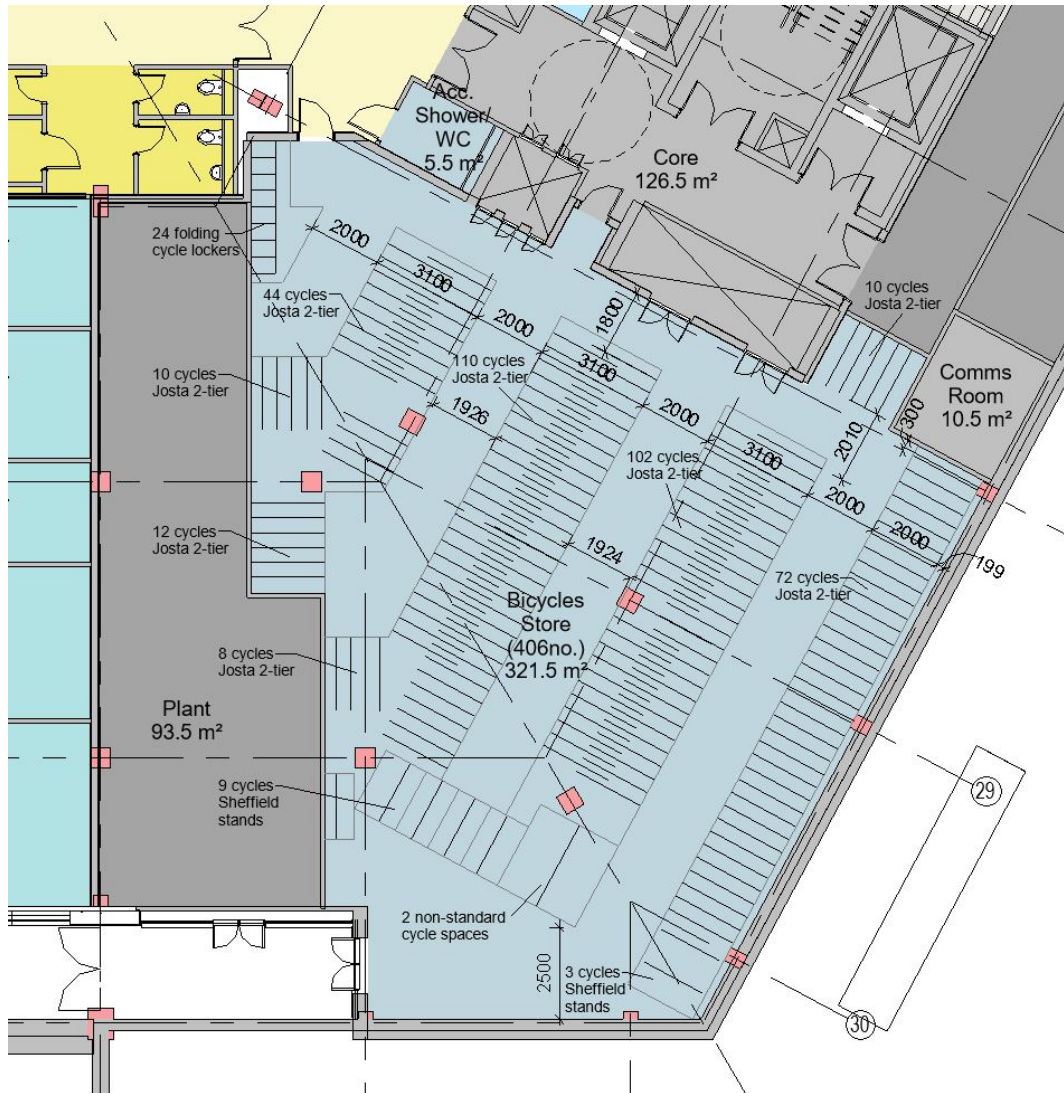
Lower Ground Floor Plan – updated bicycle store layout (P&P)
